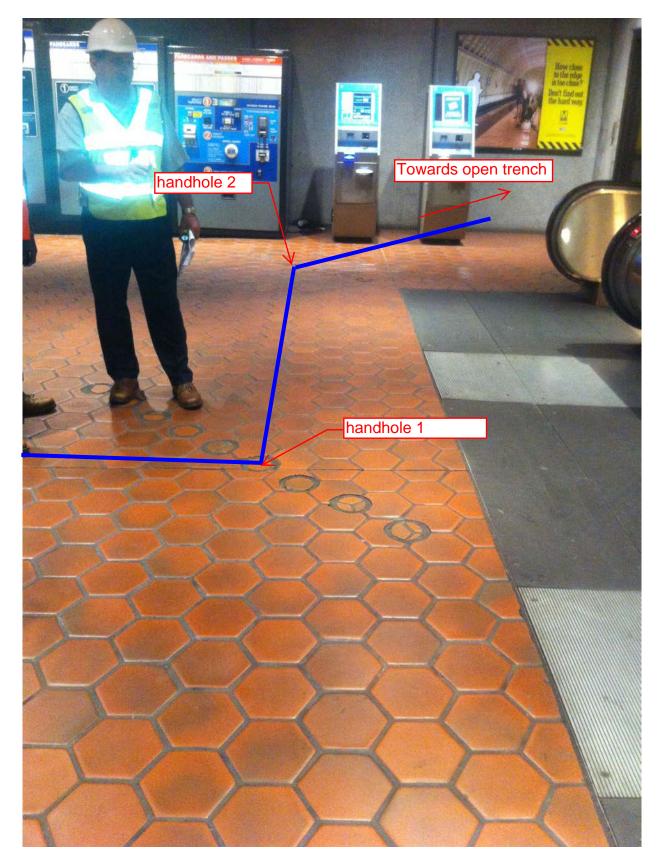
A05 Cleveland Park: Conduit from junction box to open trench
